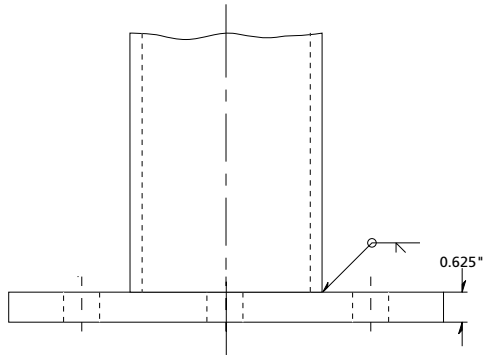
/2" x 3-1/2" x 3/16" BASEPLATE ASSEMBLY FRONT ELEVATION
